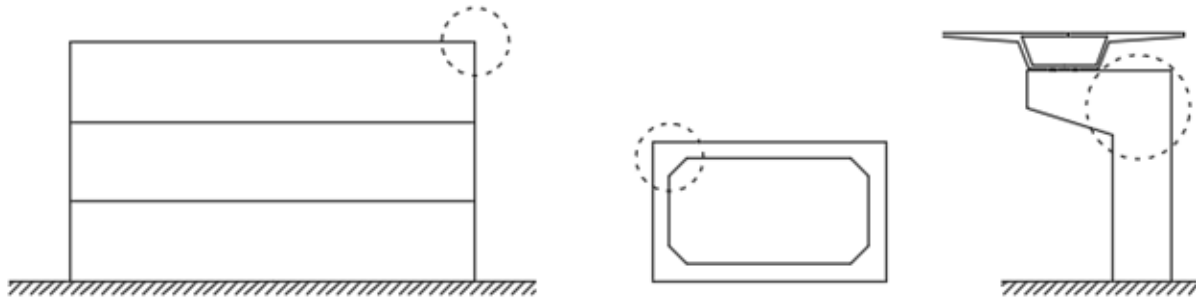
Knee-joints in (a) Parking Garage Rooftop, (b) Box Culverts, (c) Bridge Pier Caps
